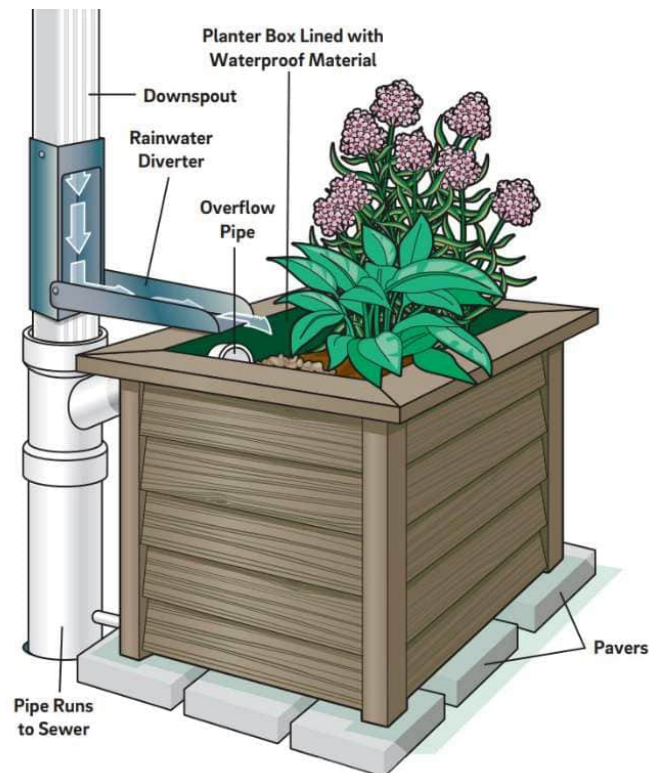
Downspout Planter Box Diagram (Source: Philadelphia Water Department)
